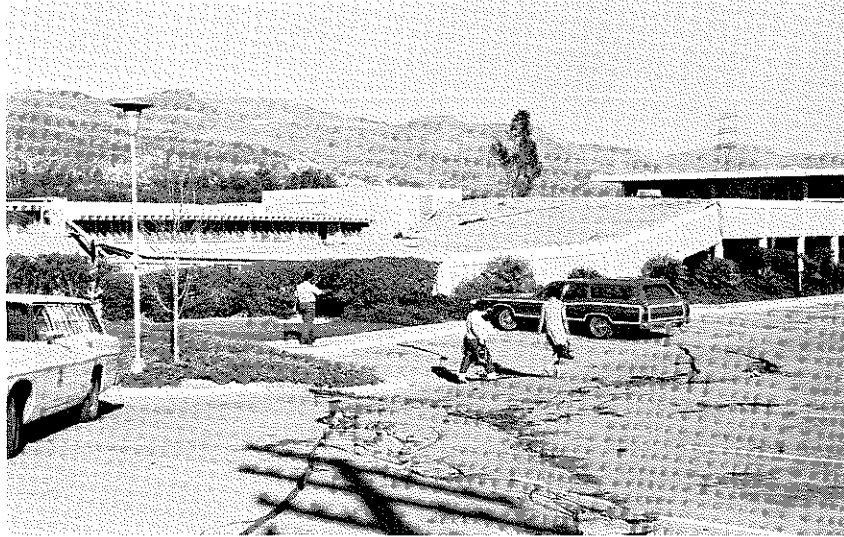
View of cracking and change in elevation of asphalt parking area; collapsed wing of concrete frame Administration Building in the background. San Fernando Juvenile Facility.
